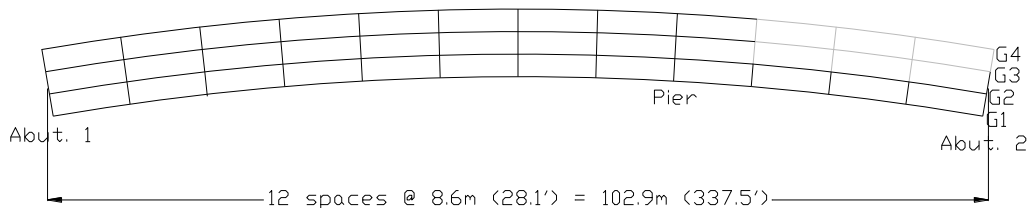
Stage 3 of Construction for Paired Girder (Inner Girders Placed First) Erection of Two Unequal Spans, 4-Girder, 305-m (1000-ft) Radius Bridge.
